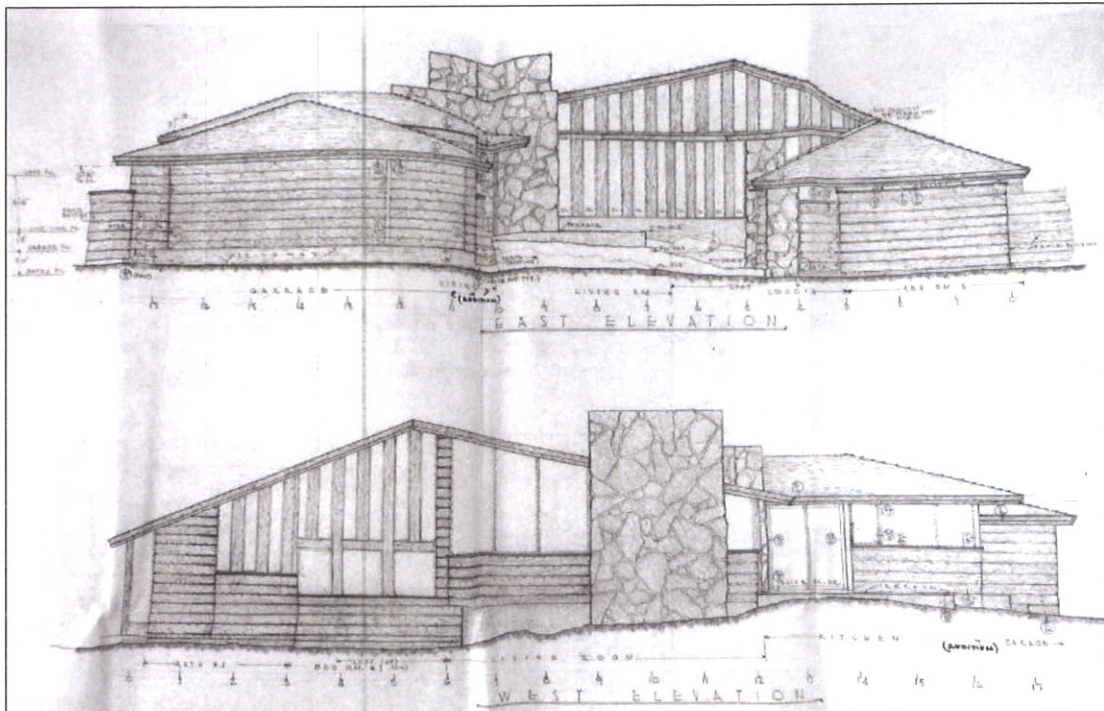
East and west elevations for Mark Mills' 1984 remodel, showing new south wing on left of east elevation and right of west elevation.
